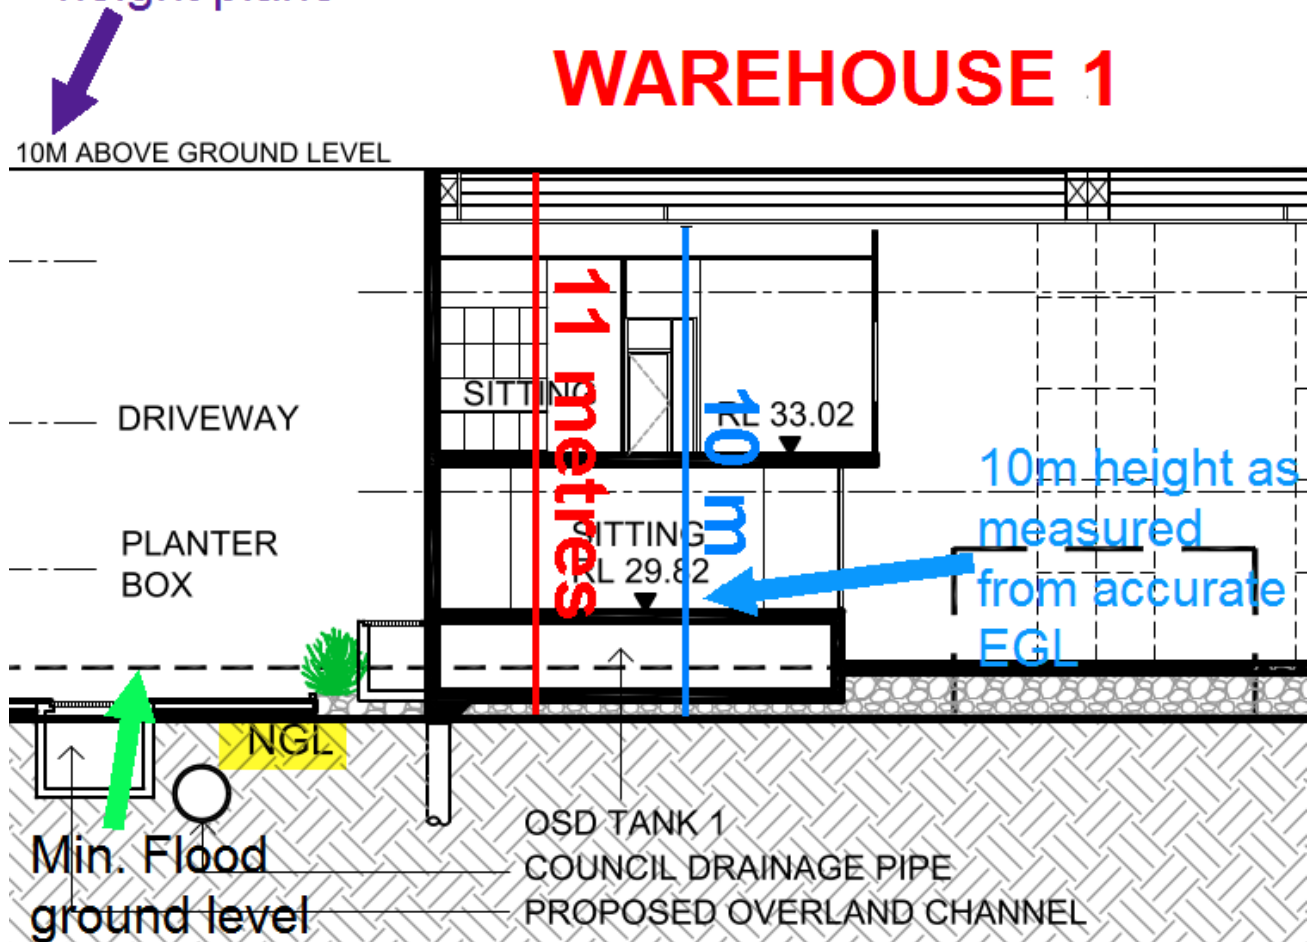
Extract (marked up) from Section A-A showing correct building height for Warehouse 1 at 11m
